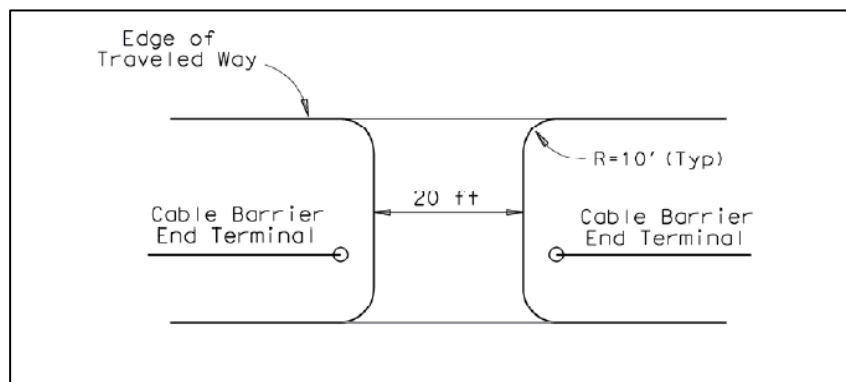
Recommended Emergency Opening Design Dimensions (29)
